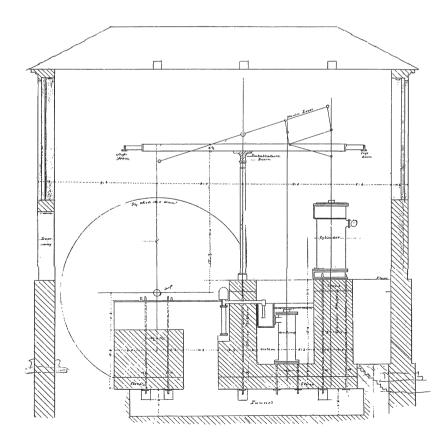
Plans from the Boulton and Watt order books for the new engine house added to an existing building at Churchend Mills, Eastington, 1822
